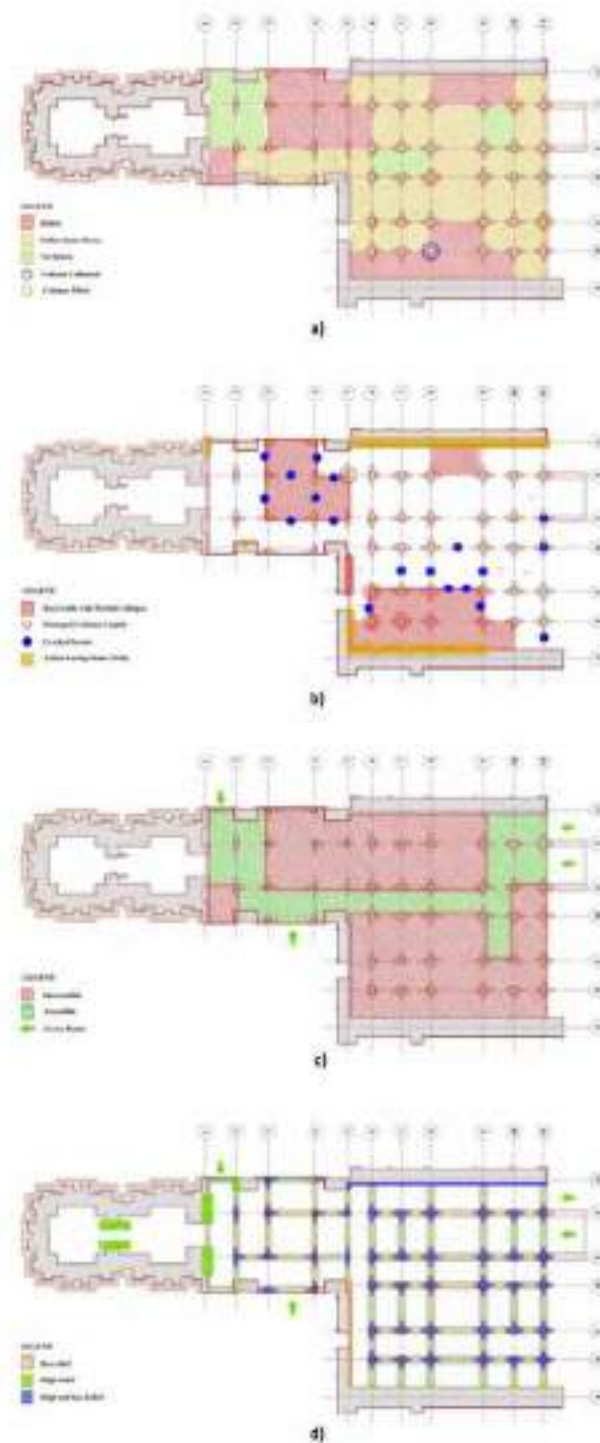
(a) Reflected ceiling plan, (b) Floor plan, (c) Access and propping plan, (d) Decorative elements distribution.
